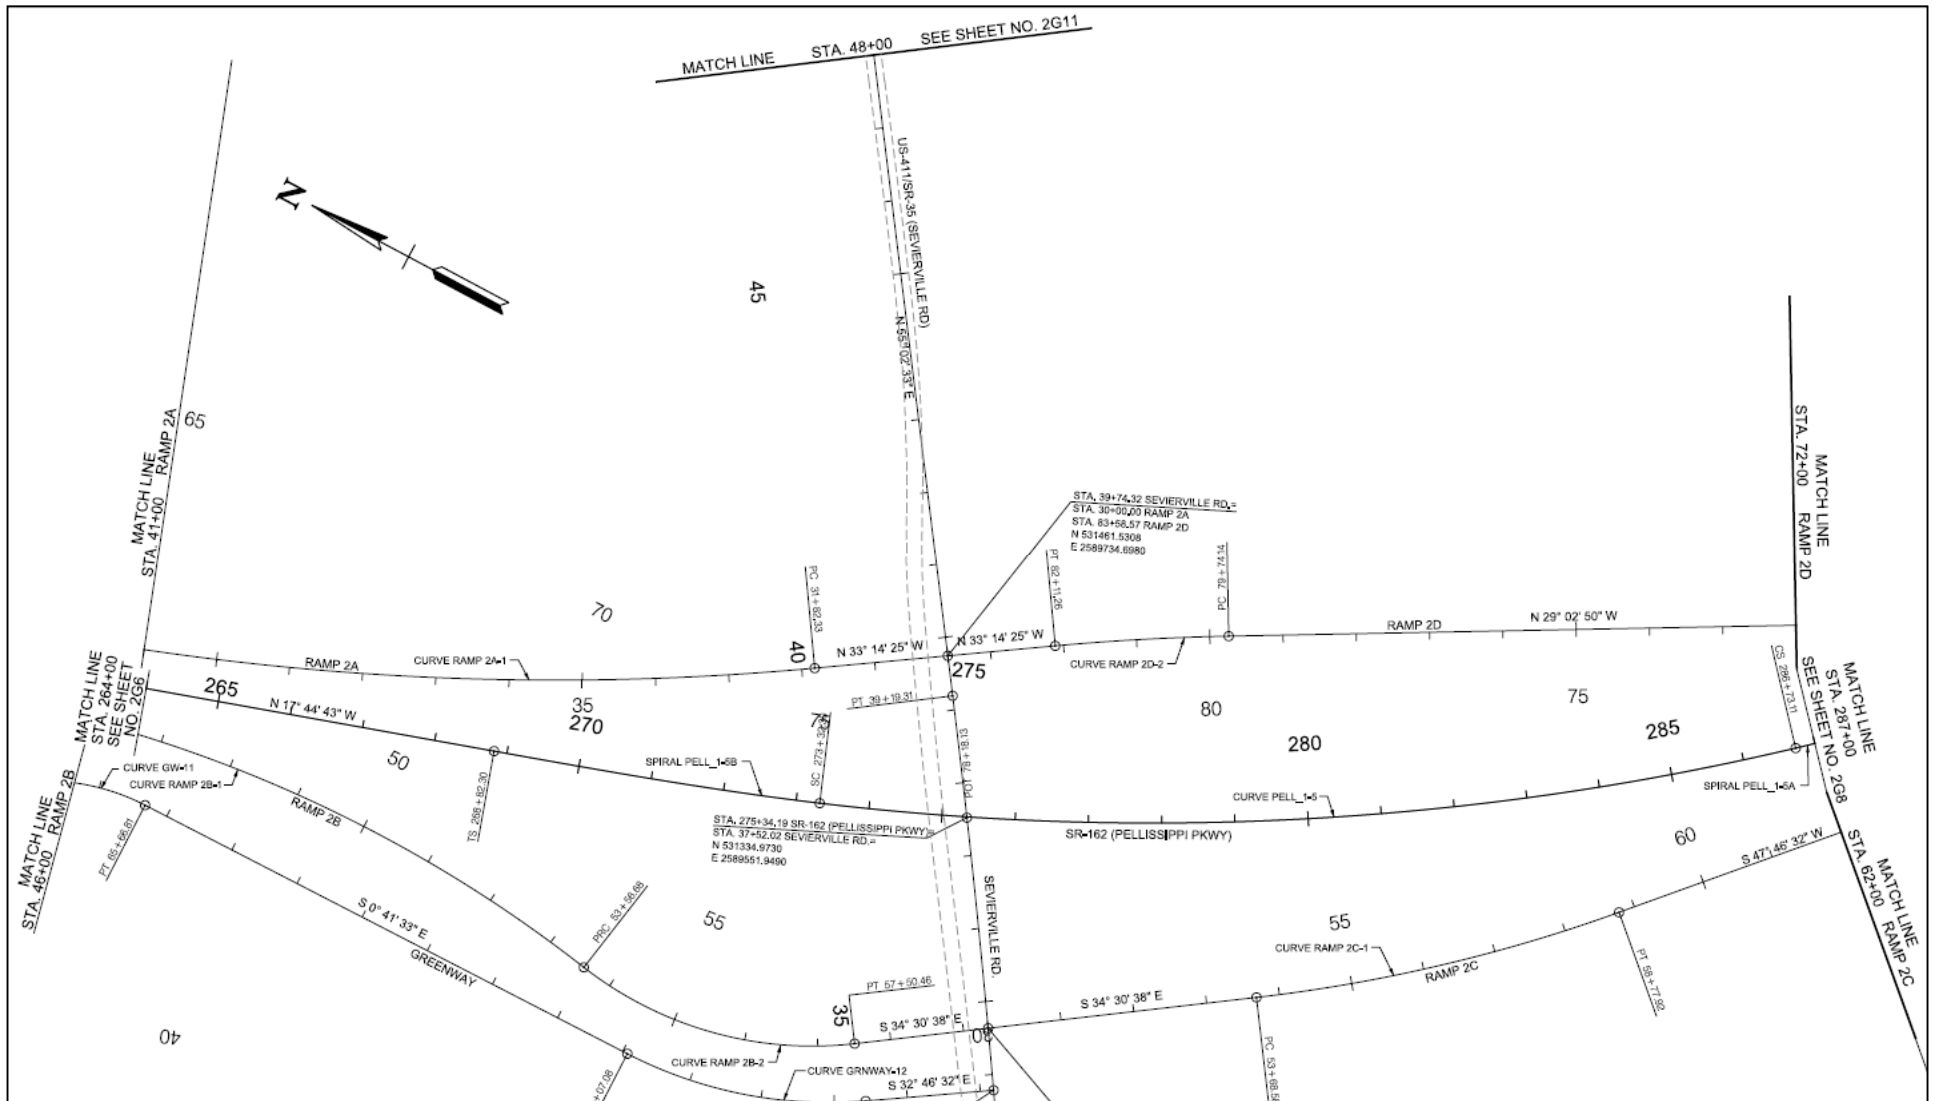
Overview 8 of 11 of the SR-162 Road Extension project from north to south.
